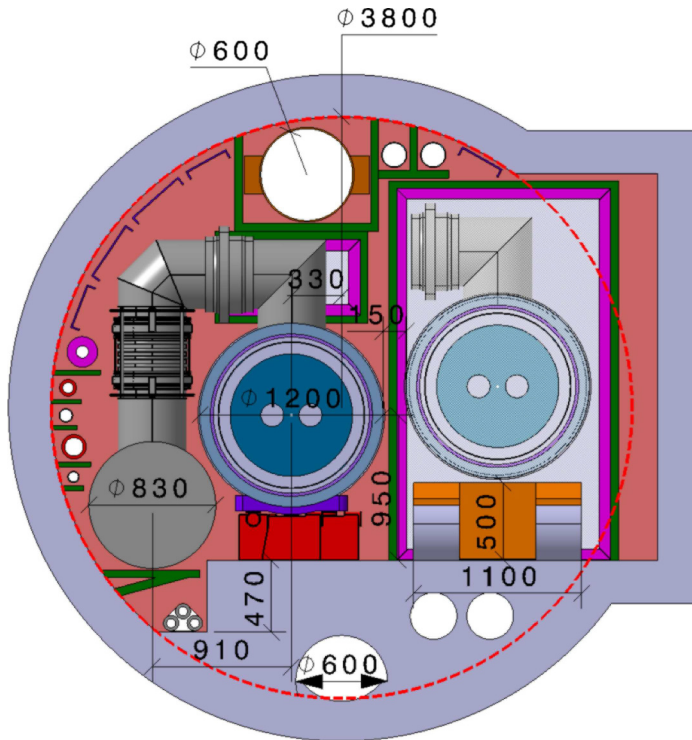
Tunnel cross section at fire compartment separation wall.
